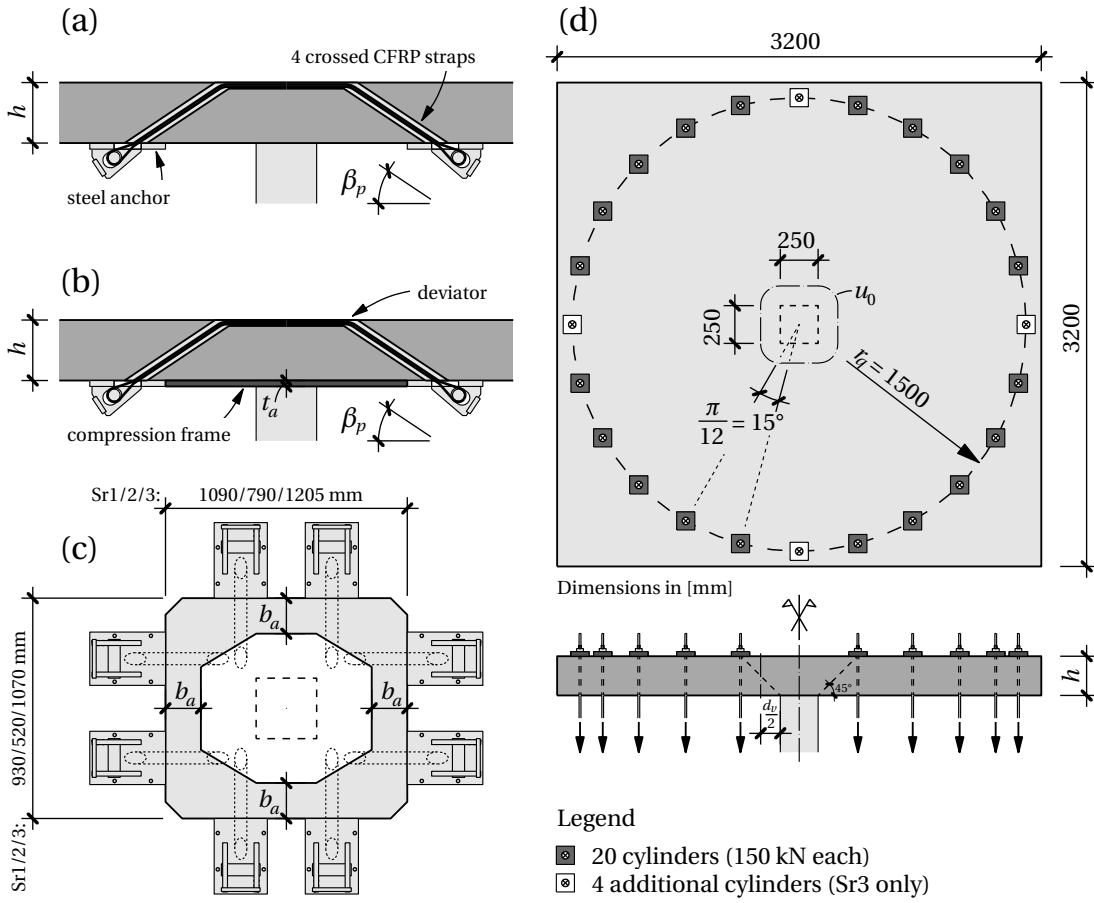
Sections of strengthening system: (a) adhesively bonded on bottom surface, (b) attached to steel compression frame, (c) Plan view of strengthening system with steel frame, (d) experimental set-up
